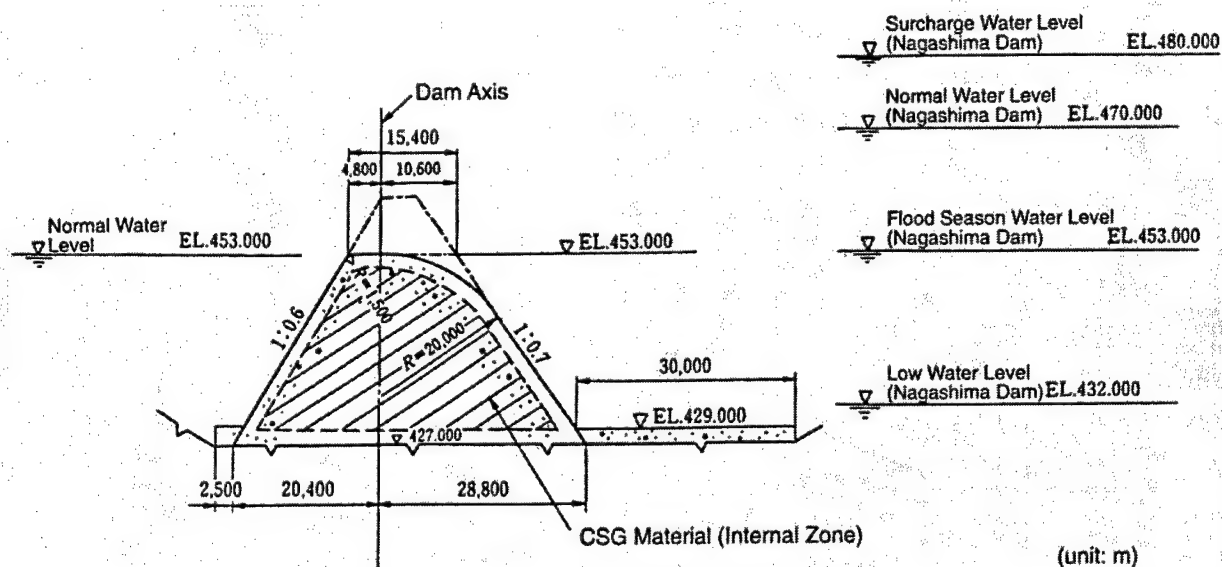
Typical cross section of coffer dam (Surikamigawa Dam)
